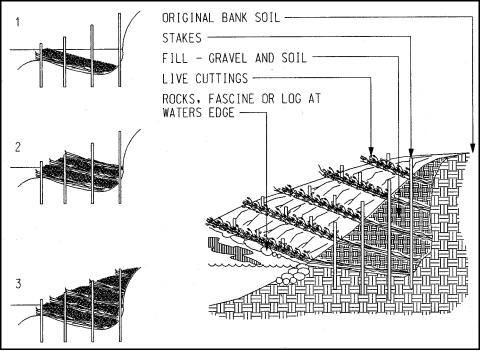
Installation of Branch Packings (Source: CBBEL Files)
